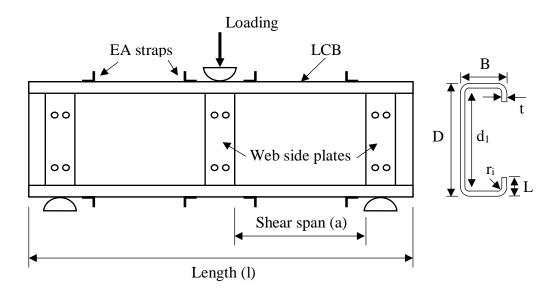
Schematic diagram of three-point loading arrangement and cross-sectional dimensions
